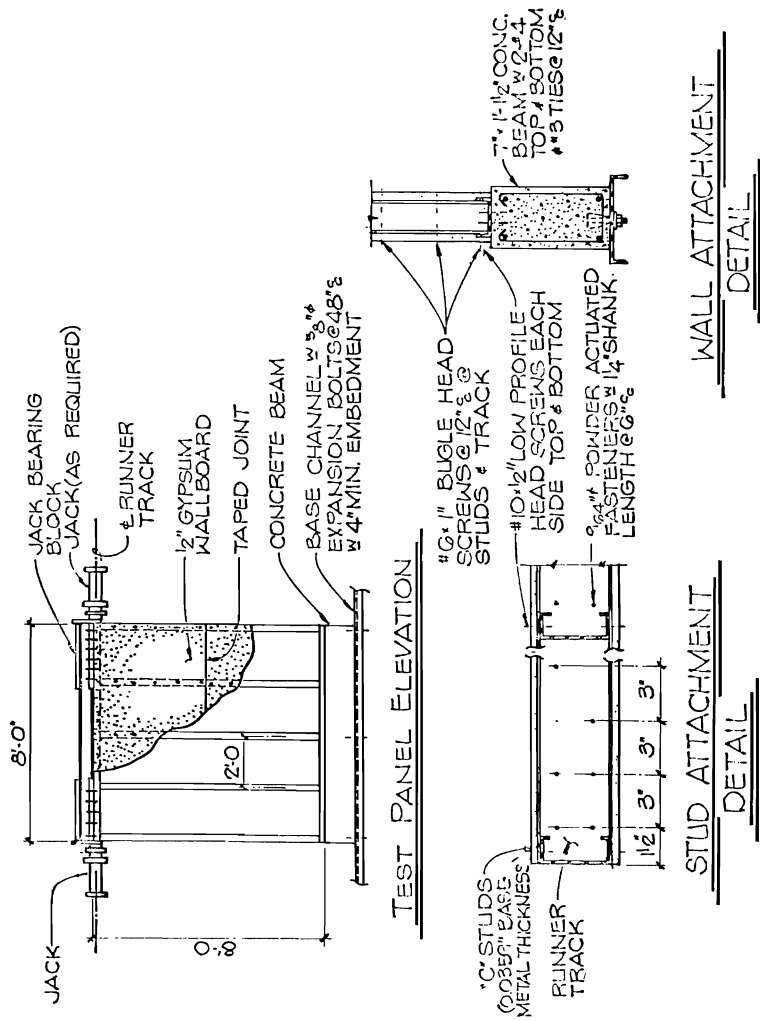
Test Assembly Plan & Details - Wall Type "H"
